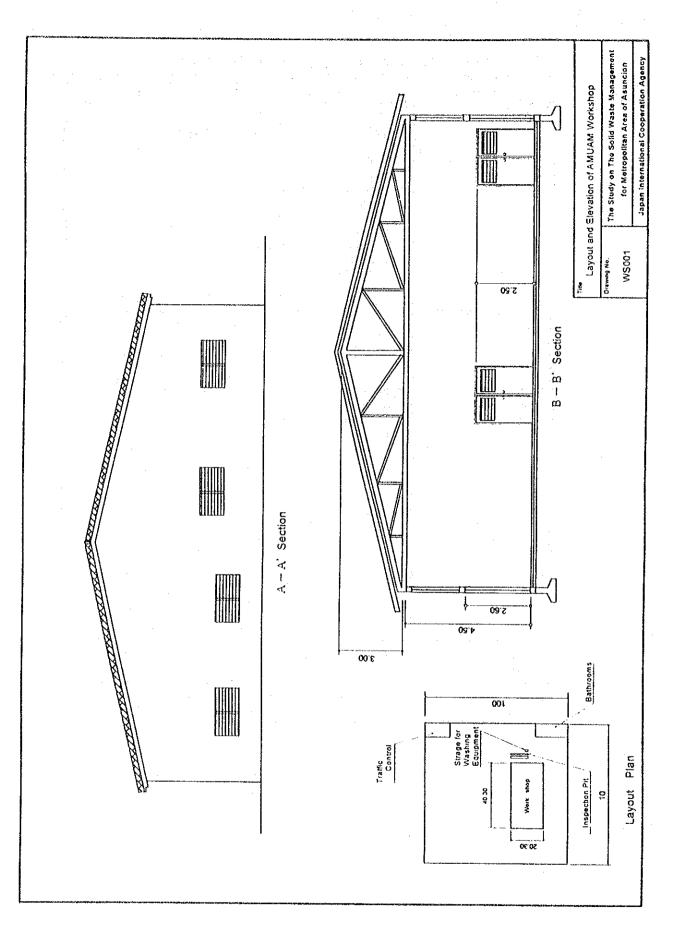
Layout and Elevation of AMUAM Workshop
